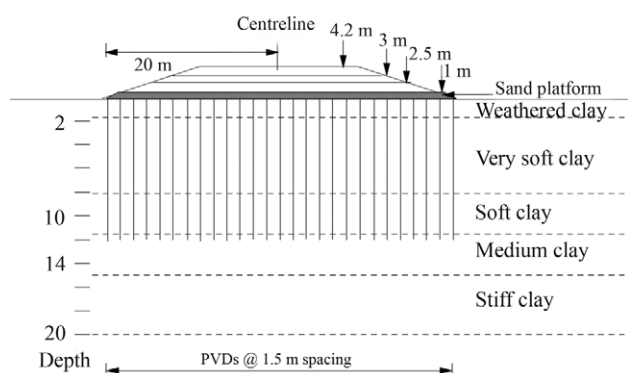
Cross section at embankment TS1 (After Indraratna & Redana, 2000).
